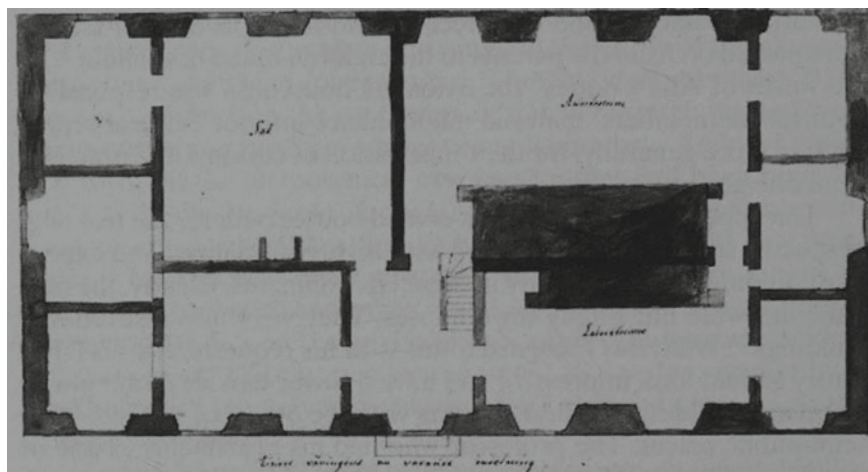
Johan Gottschalk Wallerius's chemistry laboratory building: ground plan
